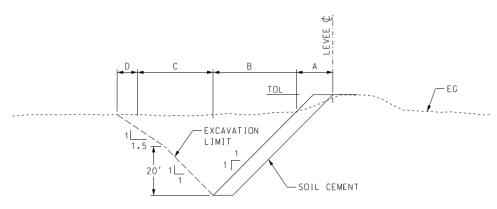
Typical Mitigation Section (Sta. 246+00, Hwy 101 Bridge, to Sta. 252+00, Stroube Drain)
